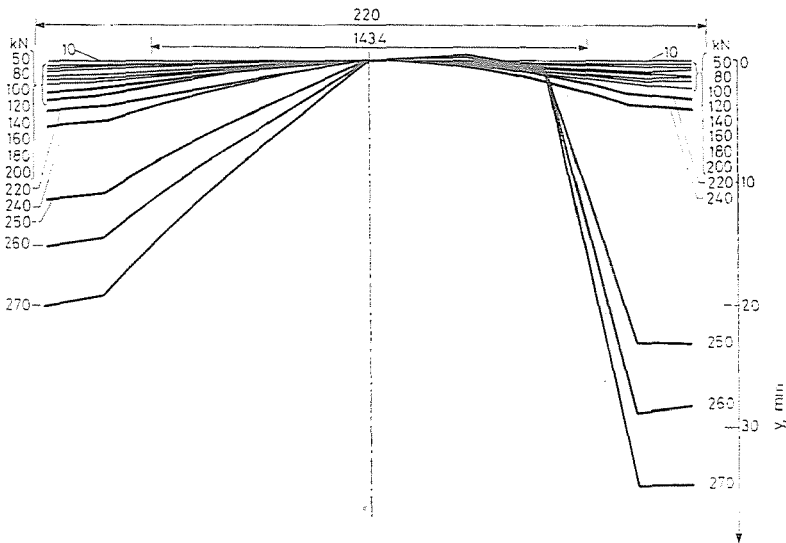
Deformations of the loaded cross section of the track slab at the different steps of load
